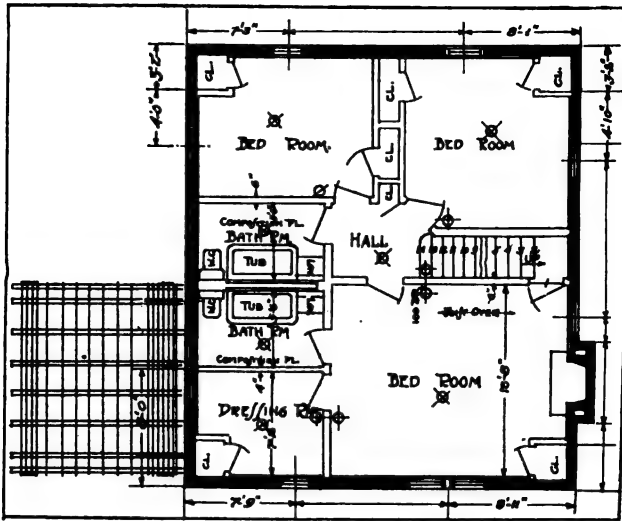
SECOND FLOOR PLAN, MORRILL "EASY-TO-KEEP" HOUSE
